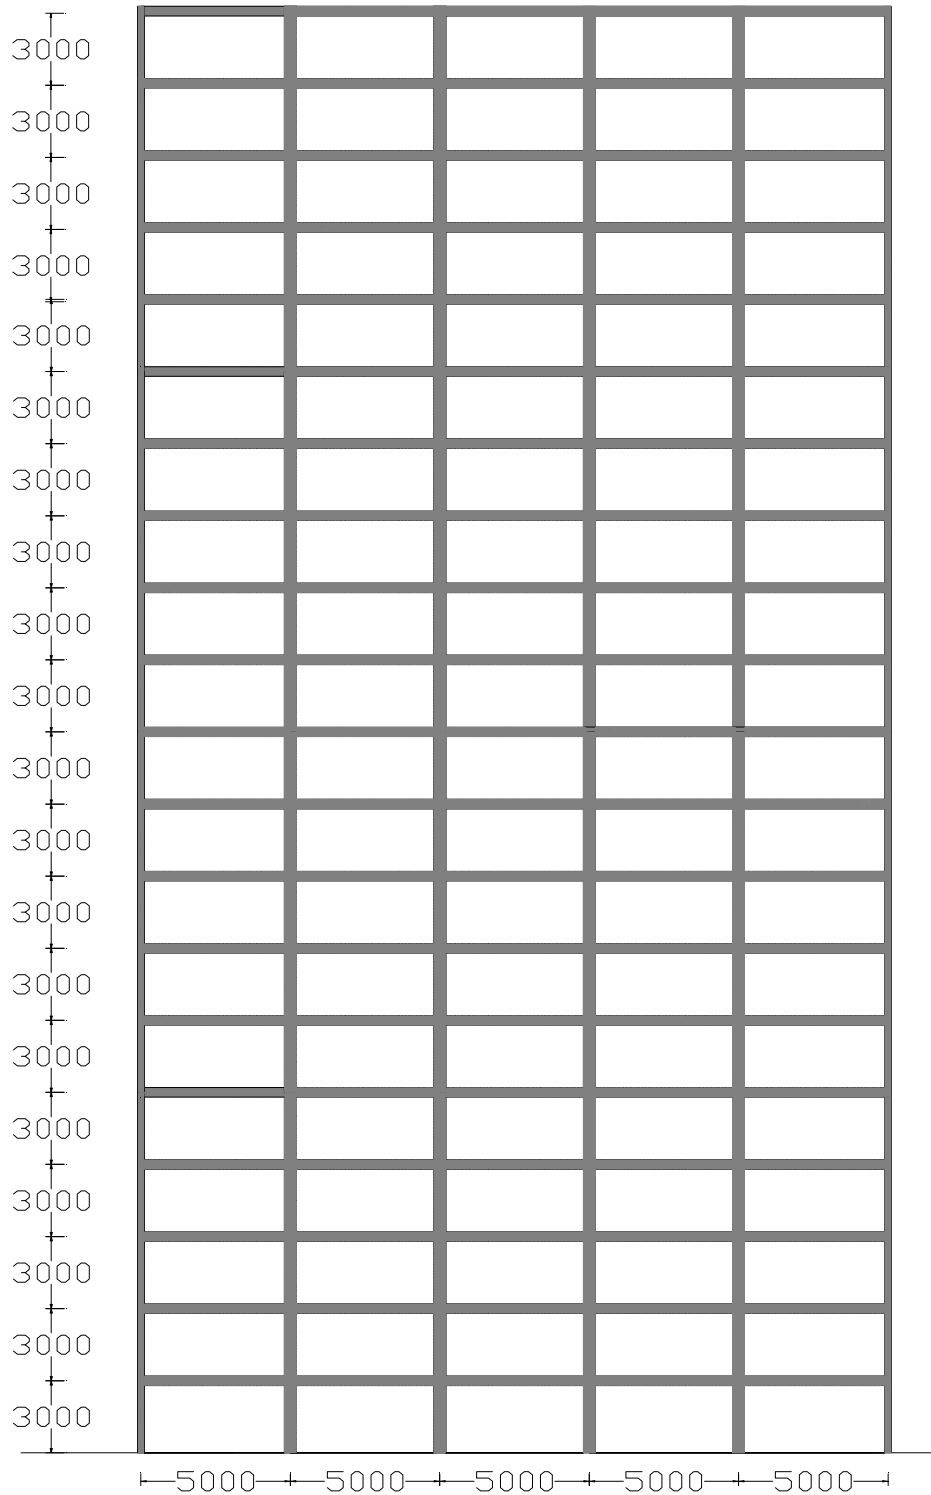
Elevation of building model 3 used for this study (dimension is in mm)
